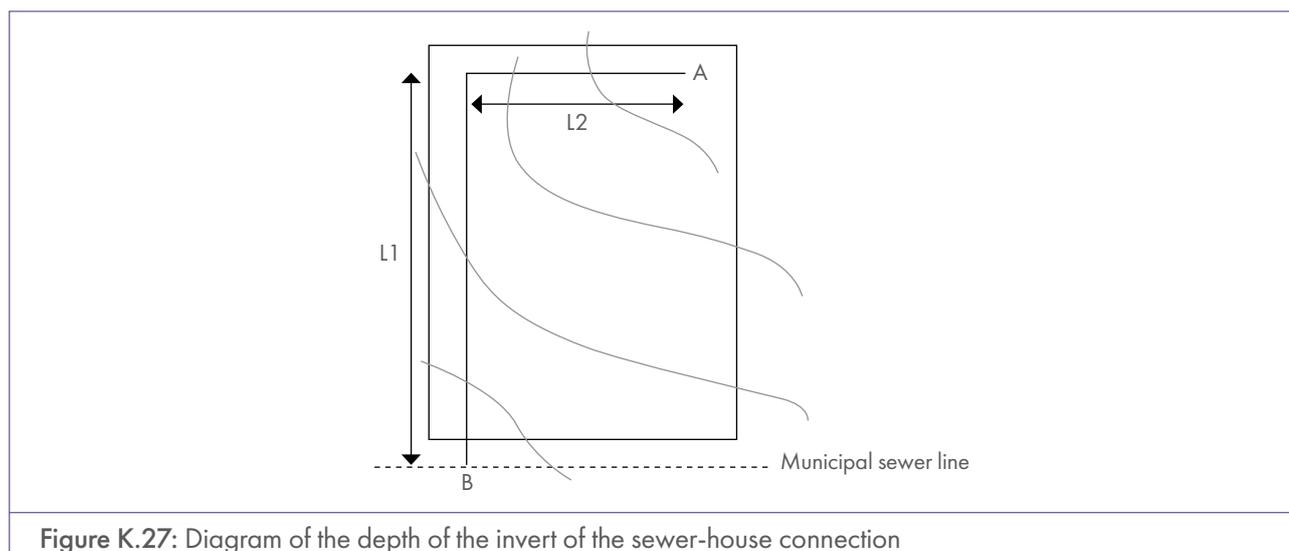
Diagram of the depth of the invert of the sewer-house connection
